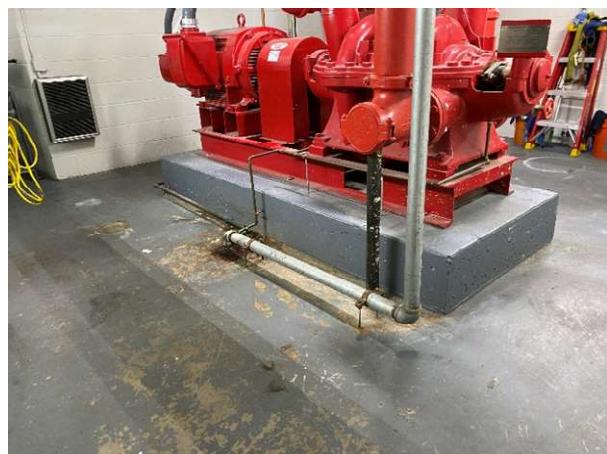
View slab in fire pump room of 46-15 Center Blvd. (C241096)
